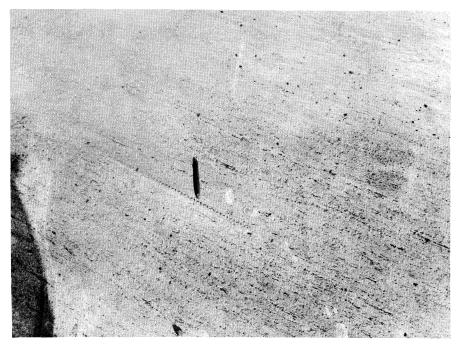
Reinforcement without cover, prior to traffic on bridge #14.
